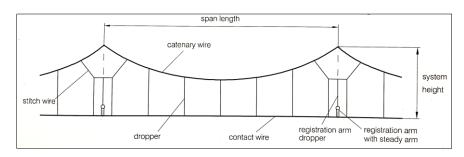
Design of a contact line section and span. (Kießling, Puschmann, and Schmieder 2001)
